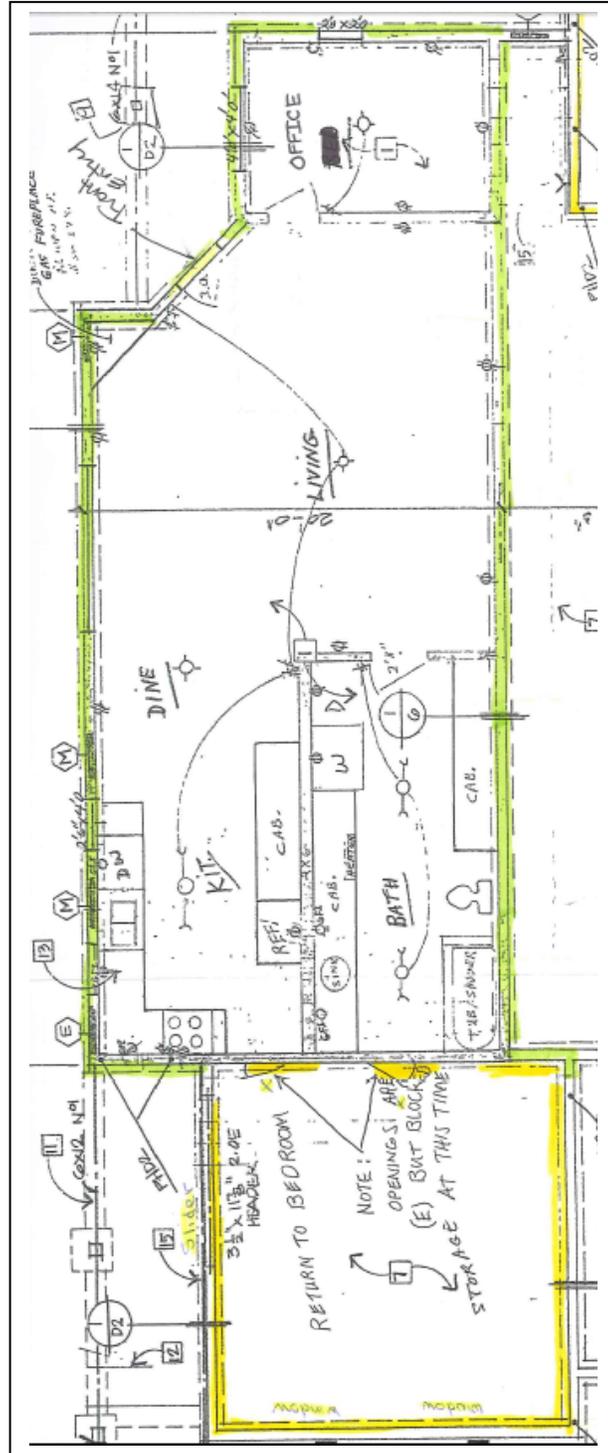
EXHIBIT C: GRAPHICS AND PLAN REDUCTIONS
